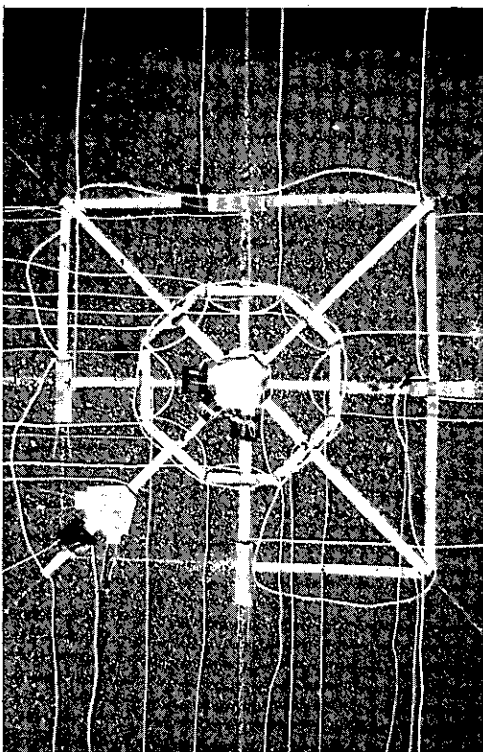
Bottom side of slab showing location and pattern of strain gages and aluminum foil tape crack sensors.
